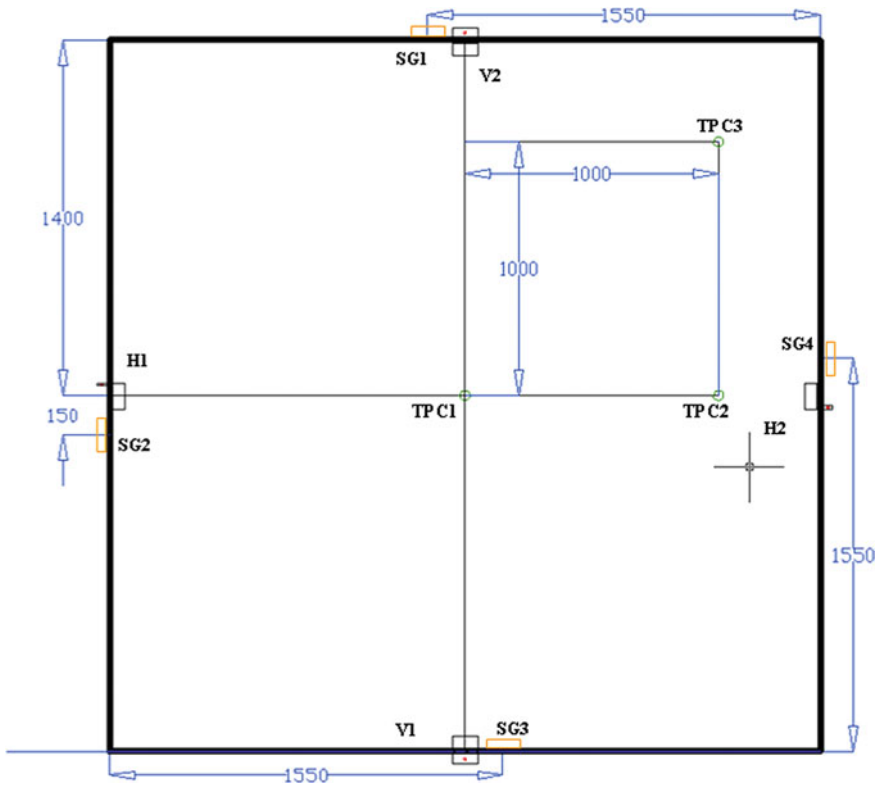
Instrumentation layout for Slab 1 (Top View)
